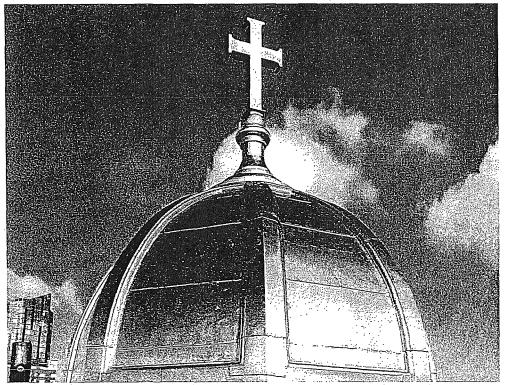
Detail, gilded sheet metal dome and cross. (Palisade Builders, 05/20/2018)
